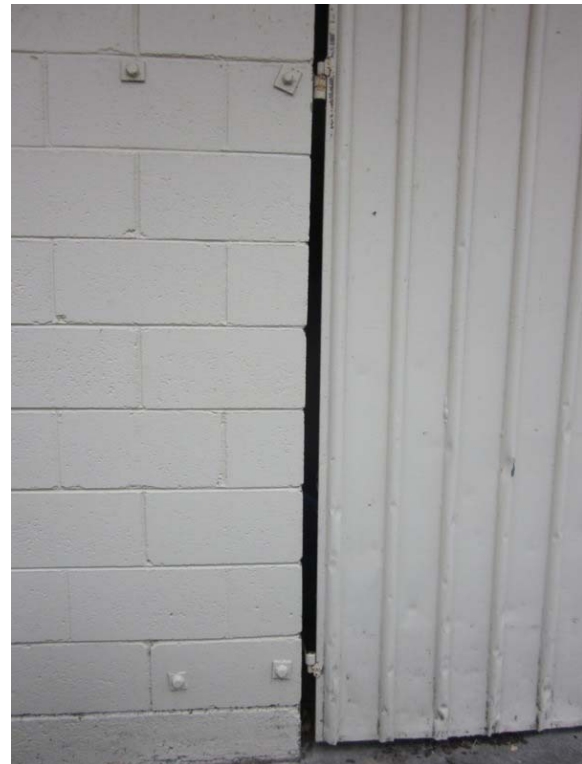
Door connection on west wall. Bolts through masonry wall visible.
